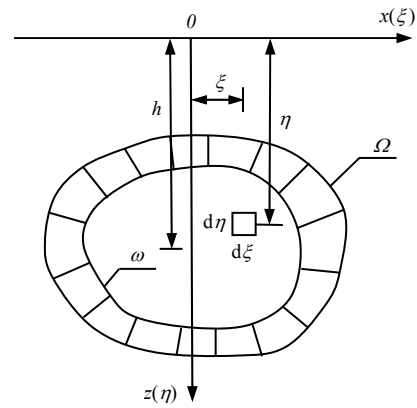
Schematic diagram of excavation of any cross section of the tunnel
